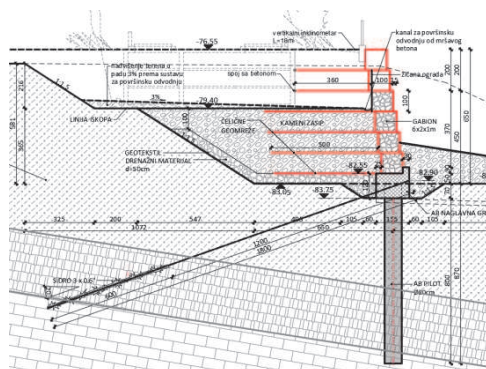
Characteristic cross section (Terramesh system + anchored pile wall)
